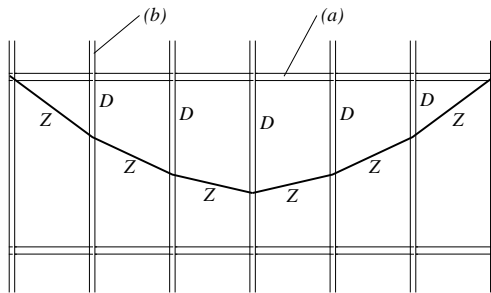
Trussed beam. (a) Braced beam, (b) purlin. (STEP 1995 Article D9)
